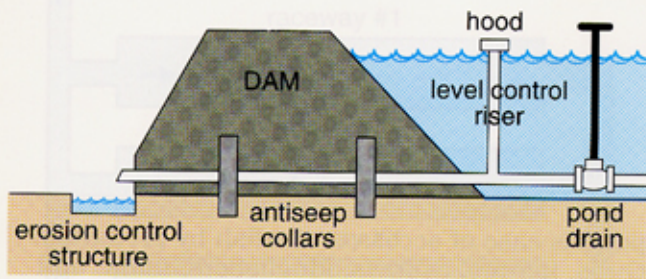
Fish pond dam with valve to control pond drainage (after Wheaton 1977).
